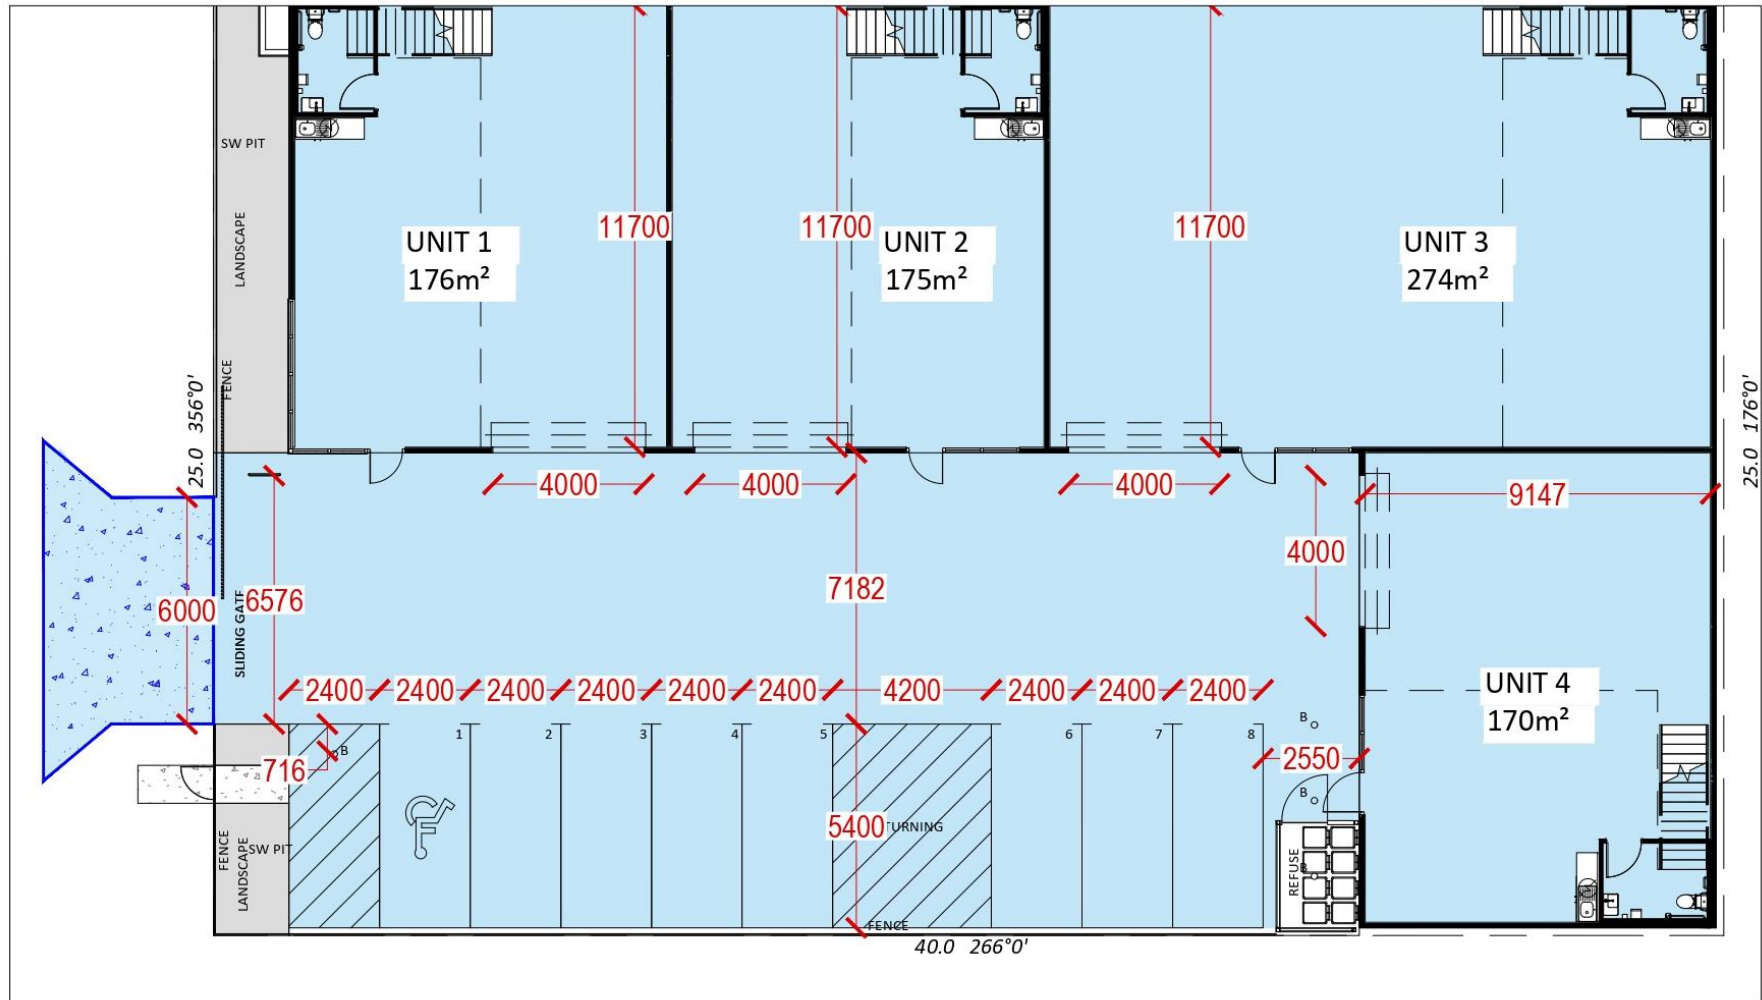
PROPOSED CAR PARKING LAYOUT AND DIMENSIONS
